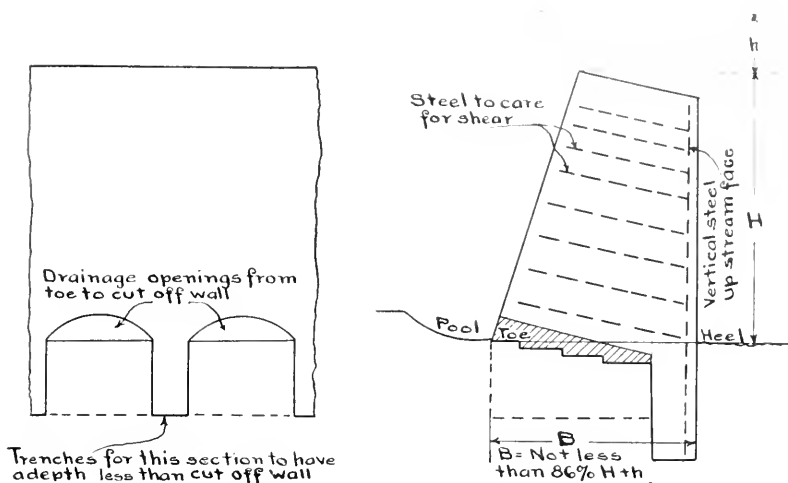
SECTION OF SOLID DAM SHOWING HOW THE ARCH CAN BE USED FOR DRAINAGE FROM CUT-OFF WALL TO THE TOE.
